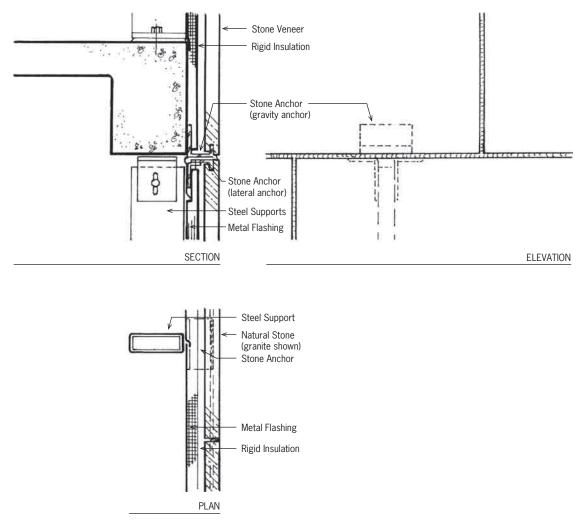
Framed masonry natural stone wall systems rely on the primary building structure and the steel supports illustrated for gravity and lateral support. The stone itself accommodates and transfers lateral loads to the stone anchors, and the stone anchors support the stone self/dead and lateral loads. The stone cladding itself accommodates and transfers loads for the enclosure system structural integrity.
